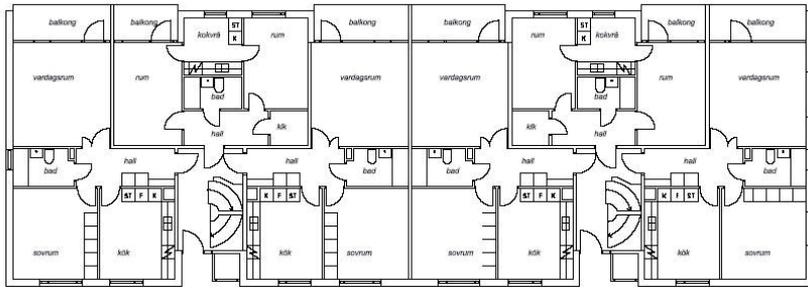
Original floor plan of the demonstration building in Brogården (Drawing: efem arkitektkontor).
